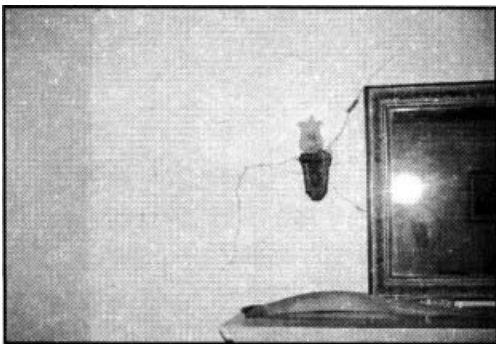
Cracks in the south wall of the living room. Crack damage was more visible on the inside of the building.
